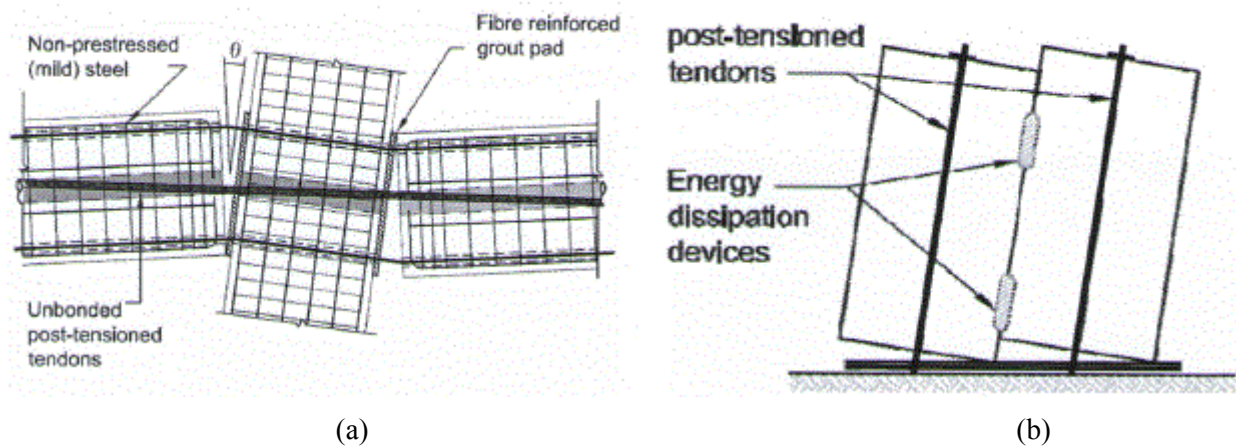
Re-centering with post-tension unbonded connection, 1(a) Frame, 1(b) Wall
